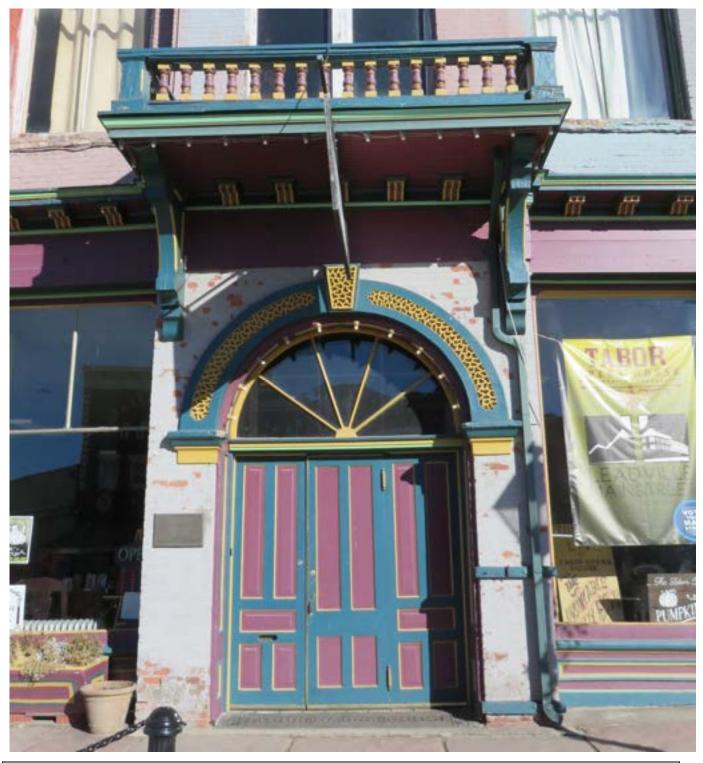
Central Main Entry and Balcony Above. The main entry door does not meet ADA requirements due to its narrow width. New doors will be provided that match the recessed panel layout of the existing doors. The existing lighting around the fanlight window and below the balcony represent safety hazards due to exposed and deteriorated wiring. The lighting will be replaced with code compliant and concealed wiring (where possible) for improved safety. The replacement decorative lighting will be similar in effect to the existing. The ornamental plaster arch above the fanlight window will be painted along with the balcony, decorative cornice, and storefront windows and doors.
